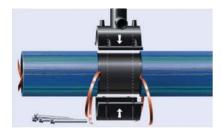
Mounting the tapping fitting according to the manufacturer's installation instructions
